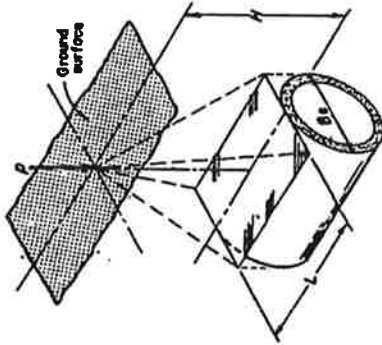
Concentrated superimposed load vertically centered over sewer pipe.
